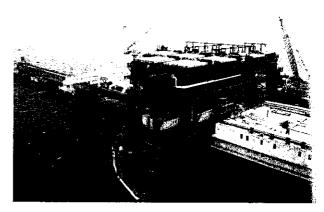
Mud water treatment facility completed at the Kawasaki Man-Made Island
